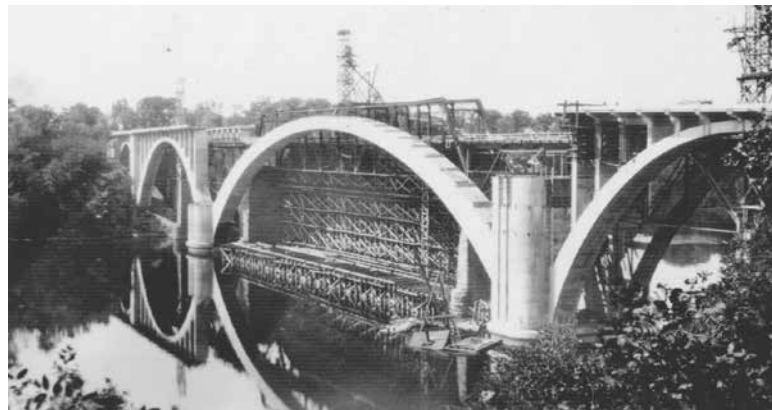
Franklin Avenue Bridge during construction, circa 1923 (from Reference 1)
